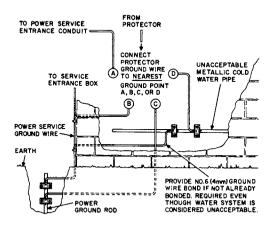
Acceptable Water System or Building Ground Not Available—MGN Power Service Grounded to Ground Rod
